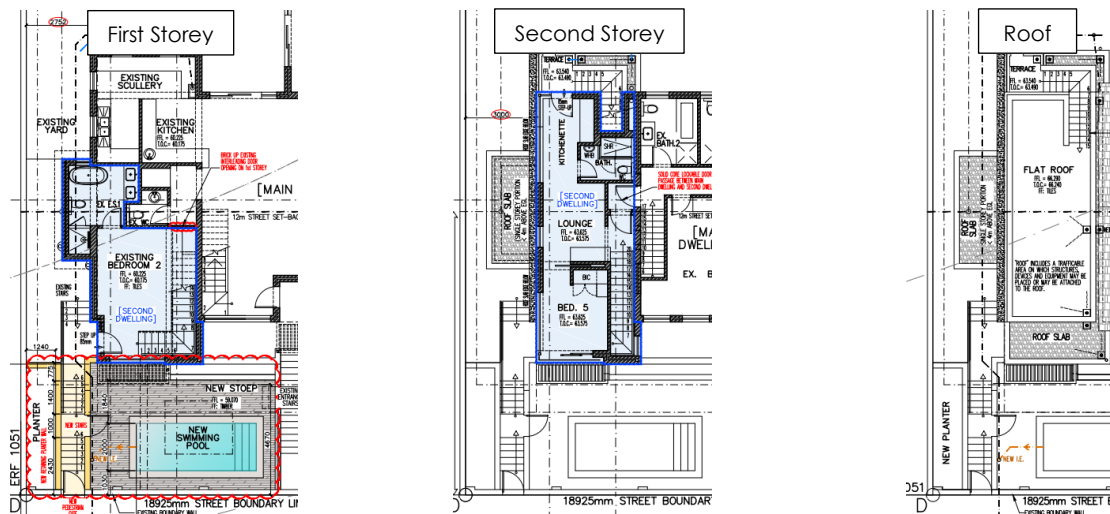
Extract from the site plans (proposed second dwelling in blue)
